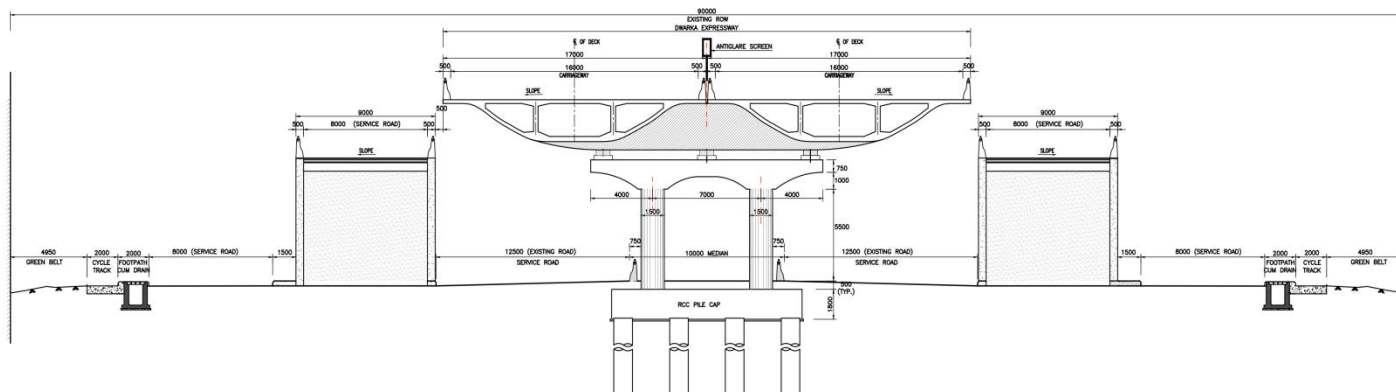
Typical Cross Section (TCS – 4) of Elevated Portion with Service Road on Ramp
